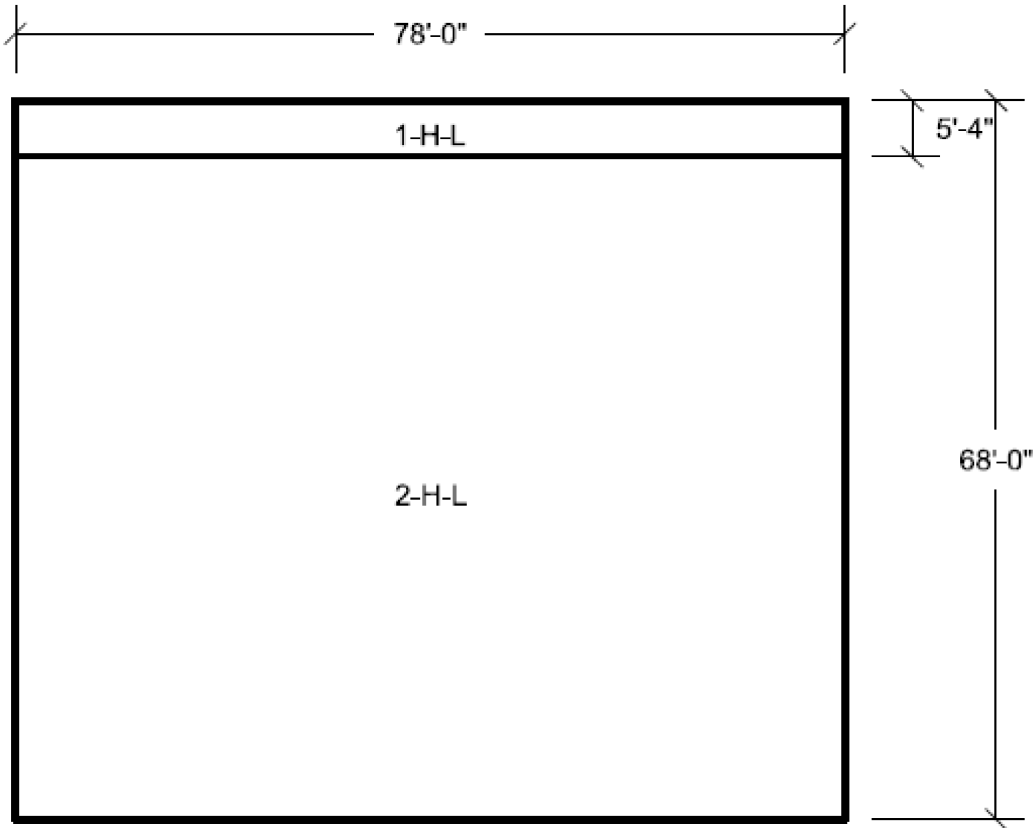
H.6-73 Pump House Internal East Wall Looking West Horizontal Reinforcement Zones Far Side Face
